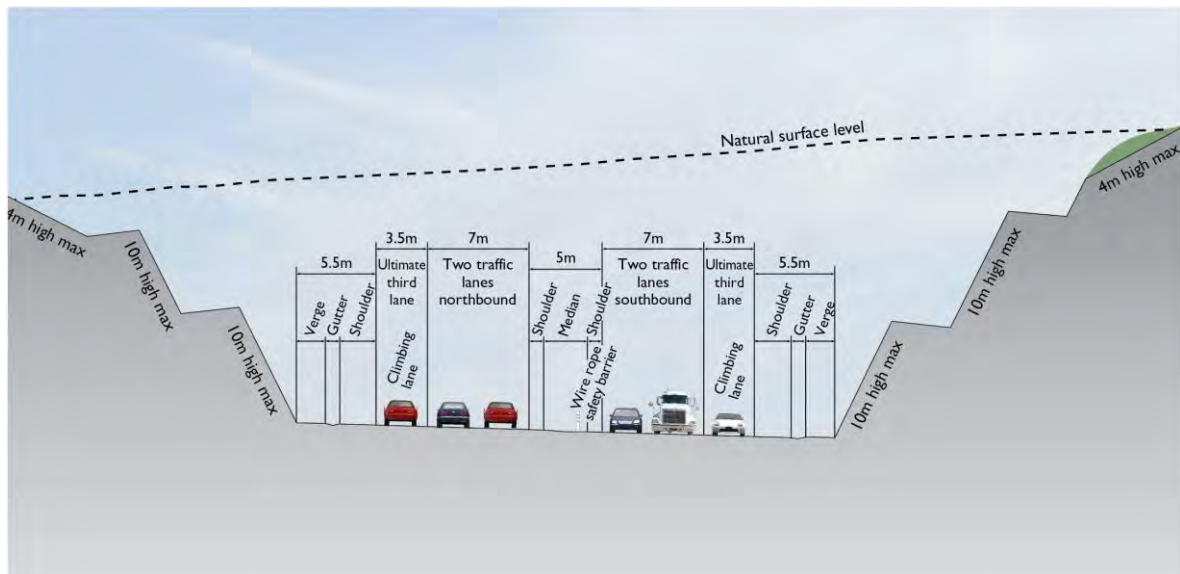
A typical cross section of Toolijooa Ridge cutting
